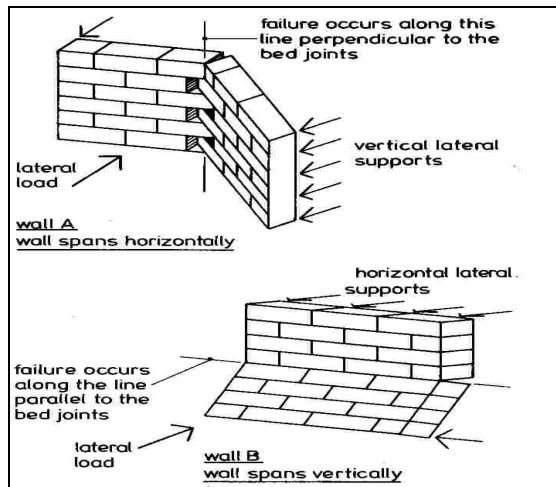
Masonry Flexural Failure Planes (Curtin, 1985:61)
